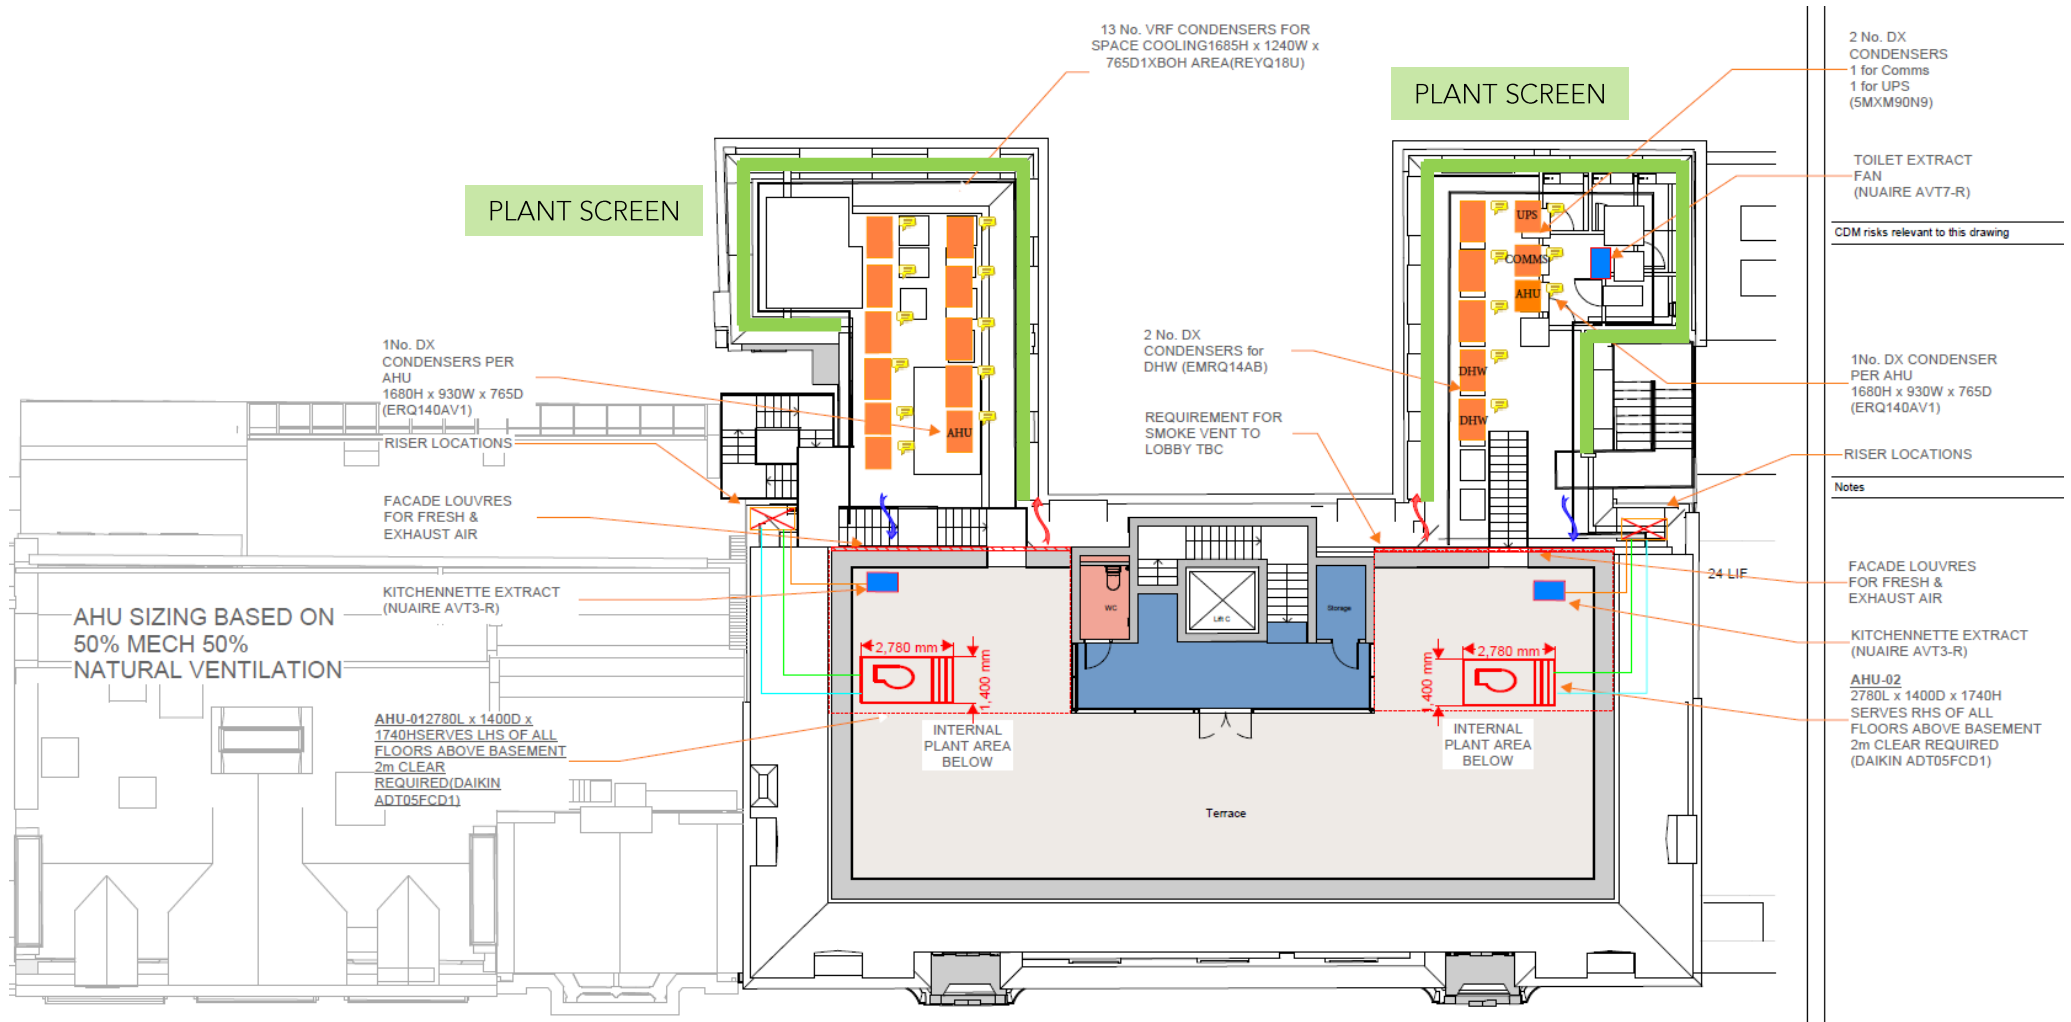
Schematic of external plant equipment layout at roof level (produced by DSA Engineering)
